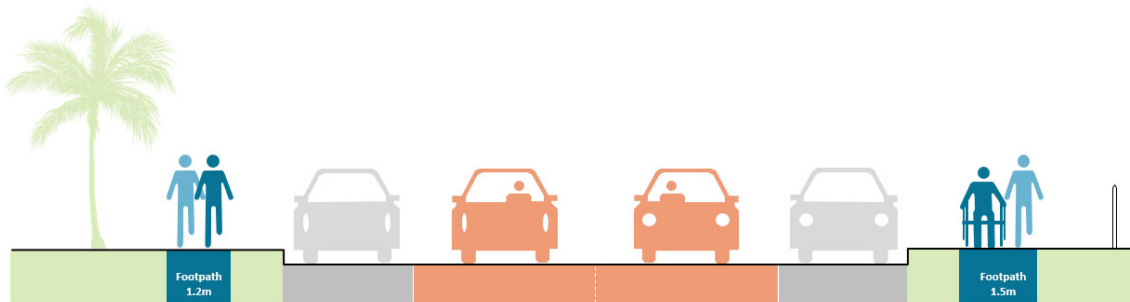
Example cross-sections of a 1.2m and a 1.5m pedestrian footpath
